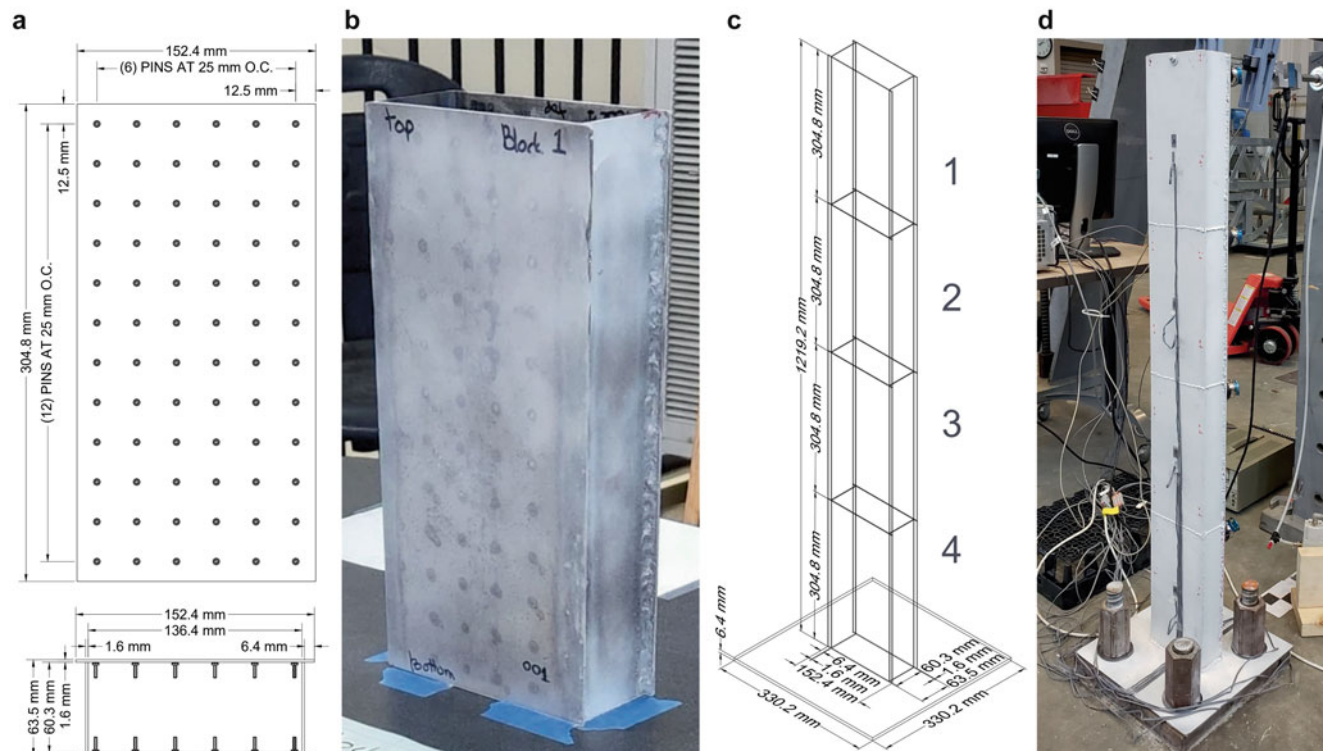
Model-scale wall: (a) design dimensions of individual wall modules; (b) photograph of fabricated module; (c) design dimensions for wall assembly; (d) photograph of instrumented specimen
